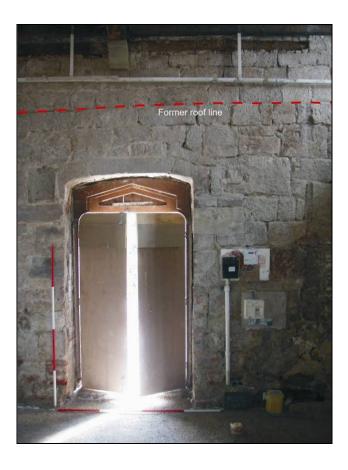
Main double doorway within the southern wall. (Scale: 2m)
